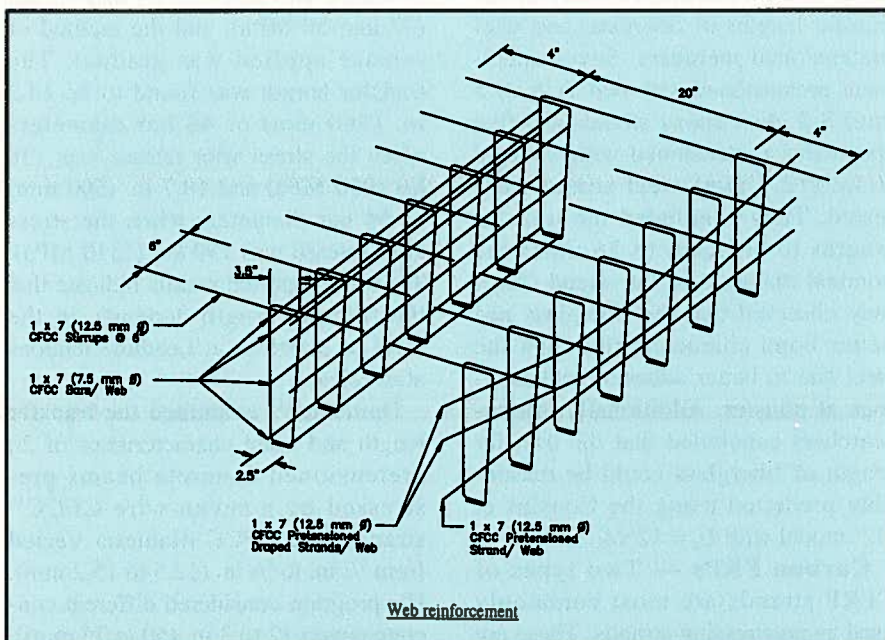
Details of CFCC flexural and shear reinforcement for DT Girders CDT2-1, 2, 3 and 4.
